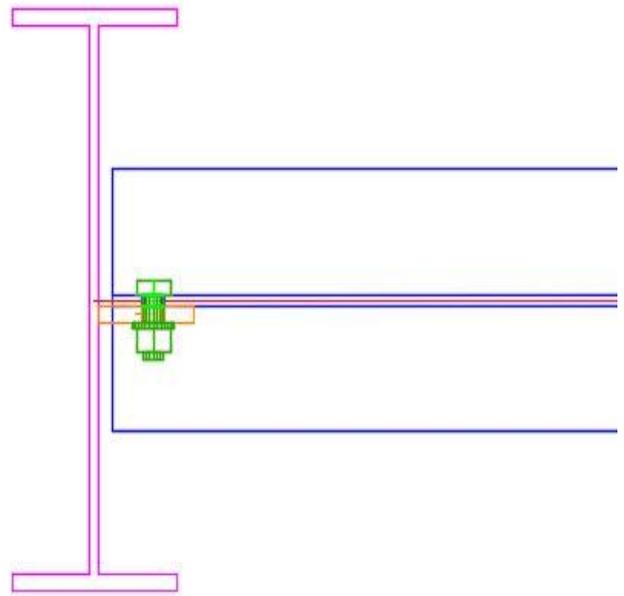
Plan view of Column & Beam shear plate connection in 2D wireframe.
